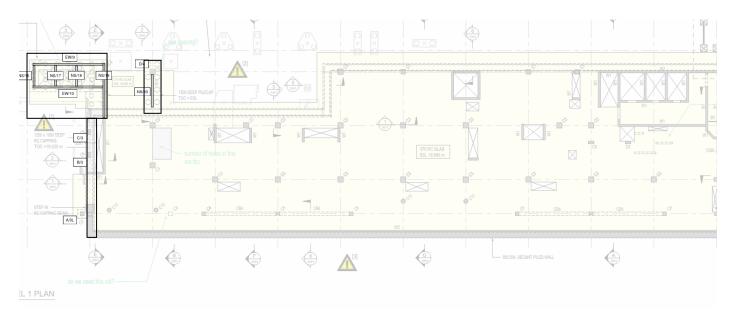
Loadings on the retaining walls and pile cap at ground floor level
